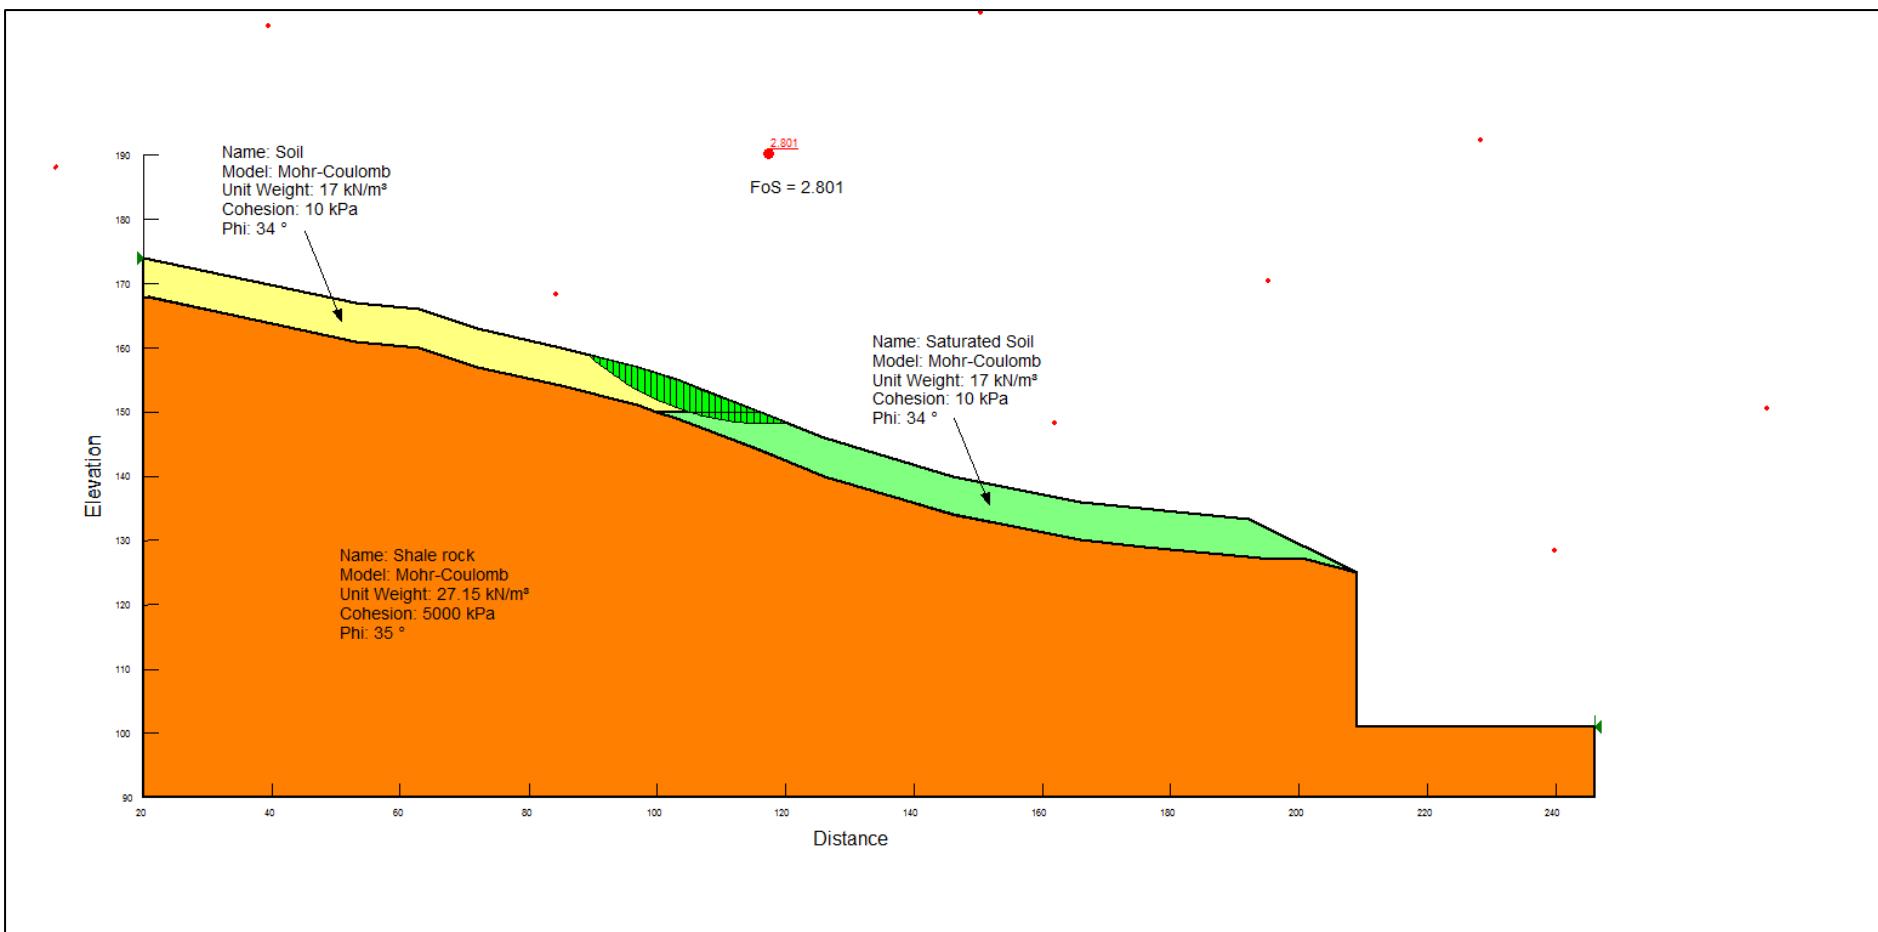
E.10: Inlet portal, Section 2, 90° excavation in shale, 1:2 excavation slope in soil
